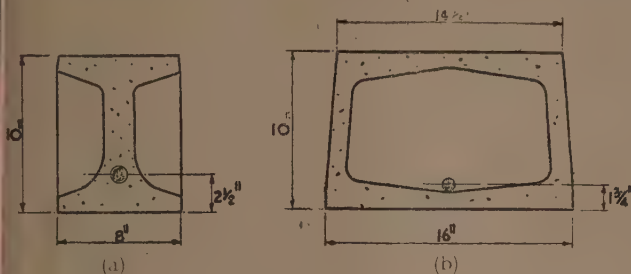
Alternative types of post-tensioned long span floors and roofs
